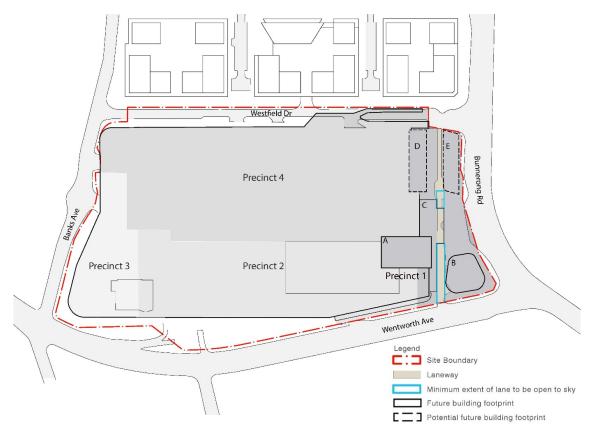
Plan showing areas of the new laneway to be designed to be opened to the sky
